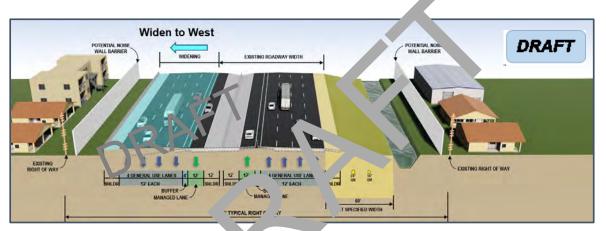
Proposed Typical Section (South Atlantic Boulevard to Wiles Road)
